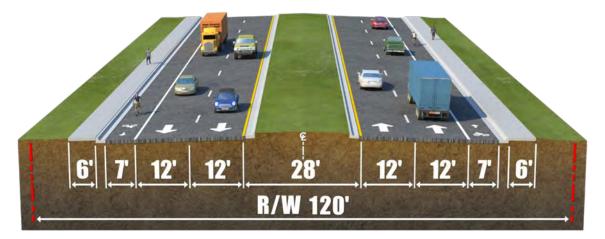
NW 49<sup>th</sup> Street Preferred Typical Section
